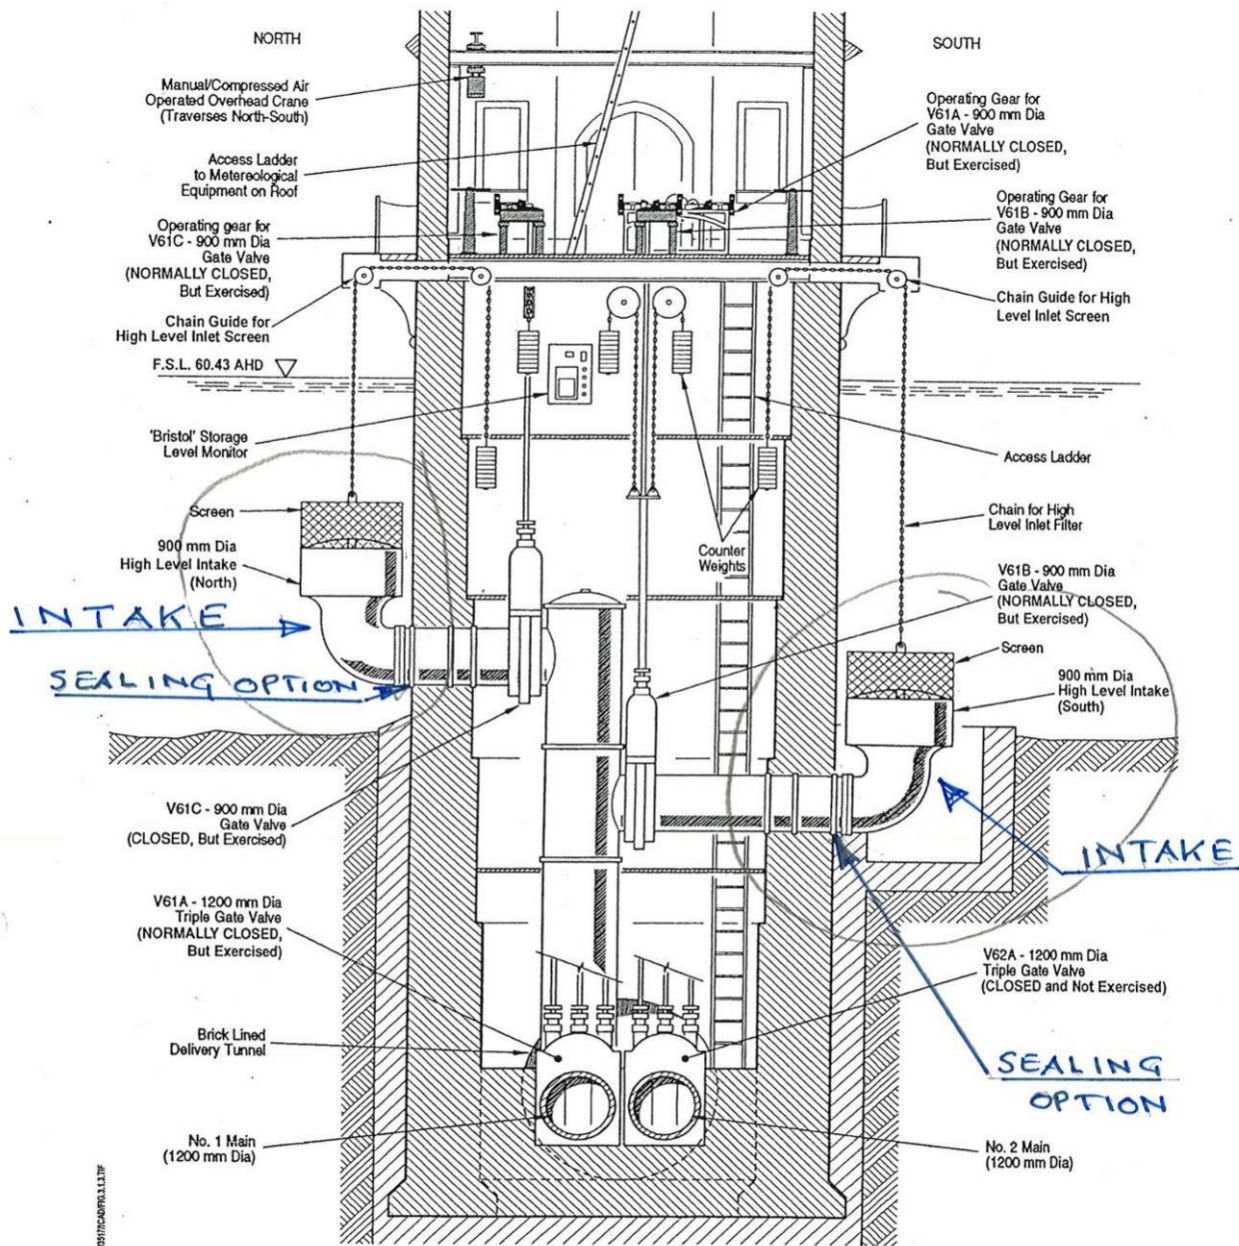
Side Elevation - Outlet Tower (Looking Downstream)
